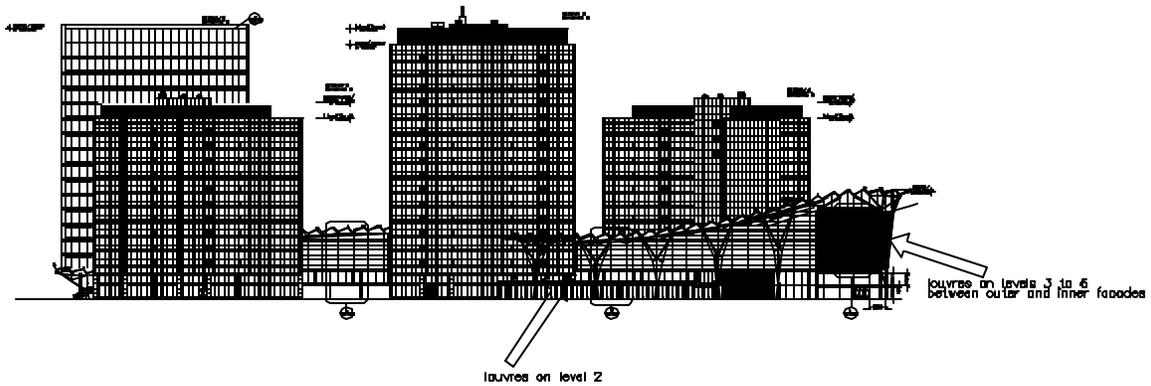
Elevation Showing Ventilation Intakes on WTC, not to scale (courtesy of KPF)
